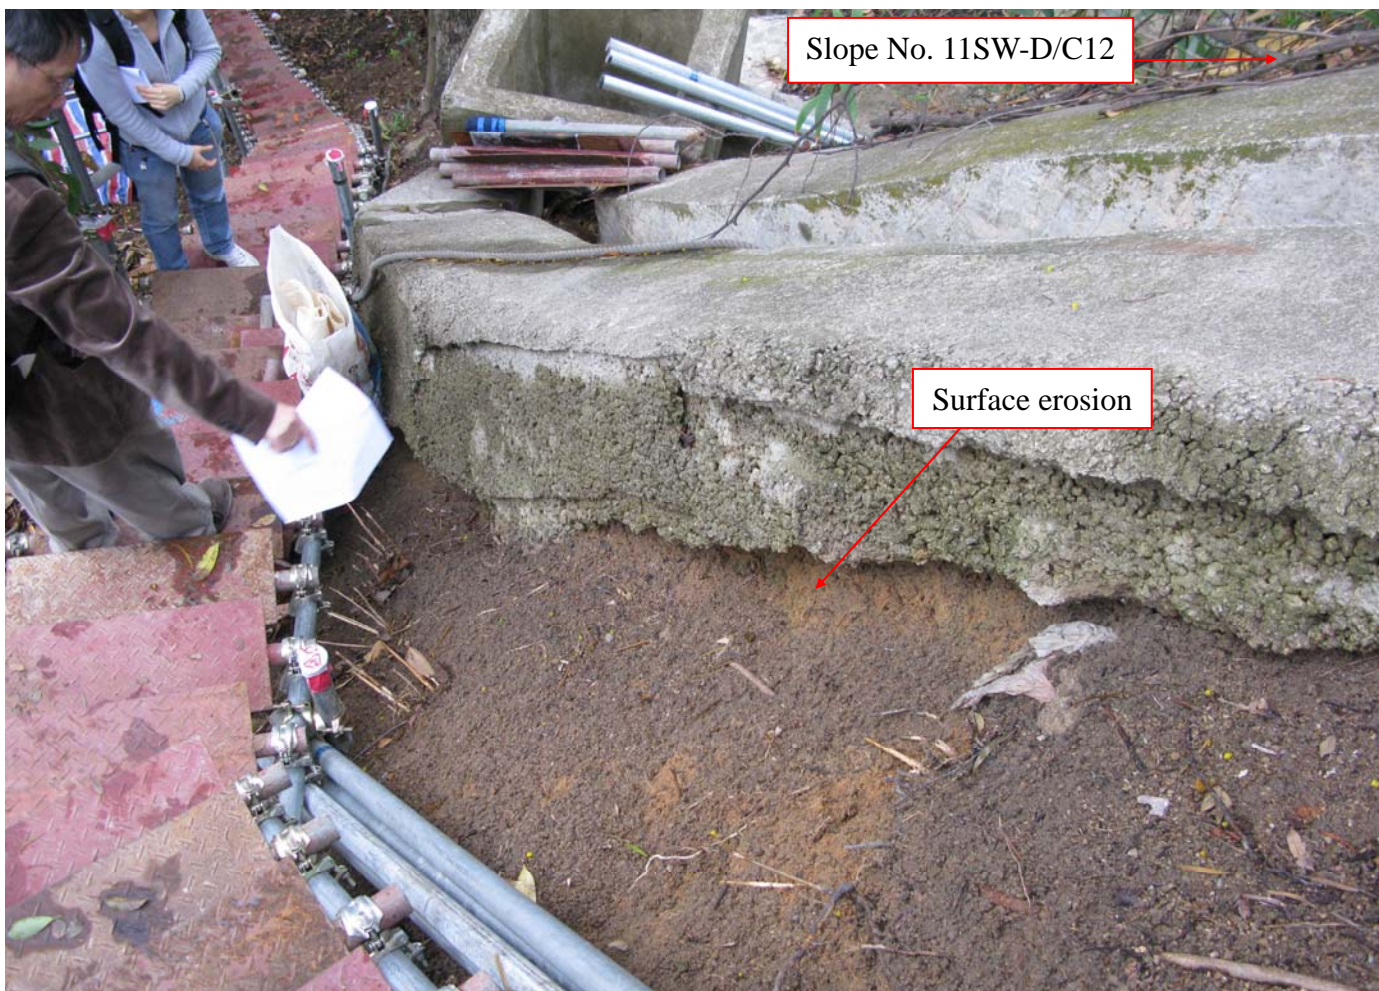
Sign of Surface Erosion at the Sides of the Surface Drainage System of Slope No. 11SW-D/C12
